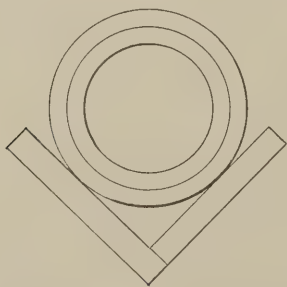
Trough for Supporting Sewer-Pipe Connection.
